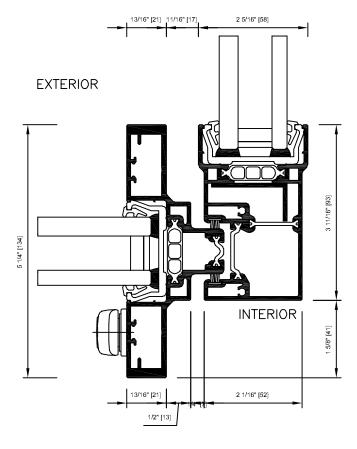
Male/Female Sliding Panels at Outside 90° Corner with Double Lock Stile and Handle
